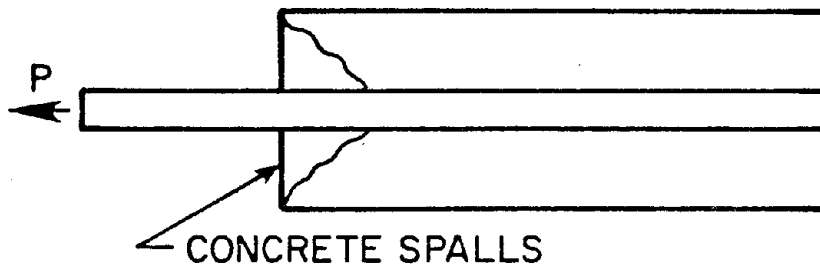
SPALLING OF CONCRETE IN PULL-OUT SPECIMEN
